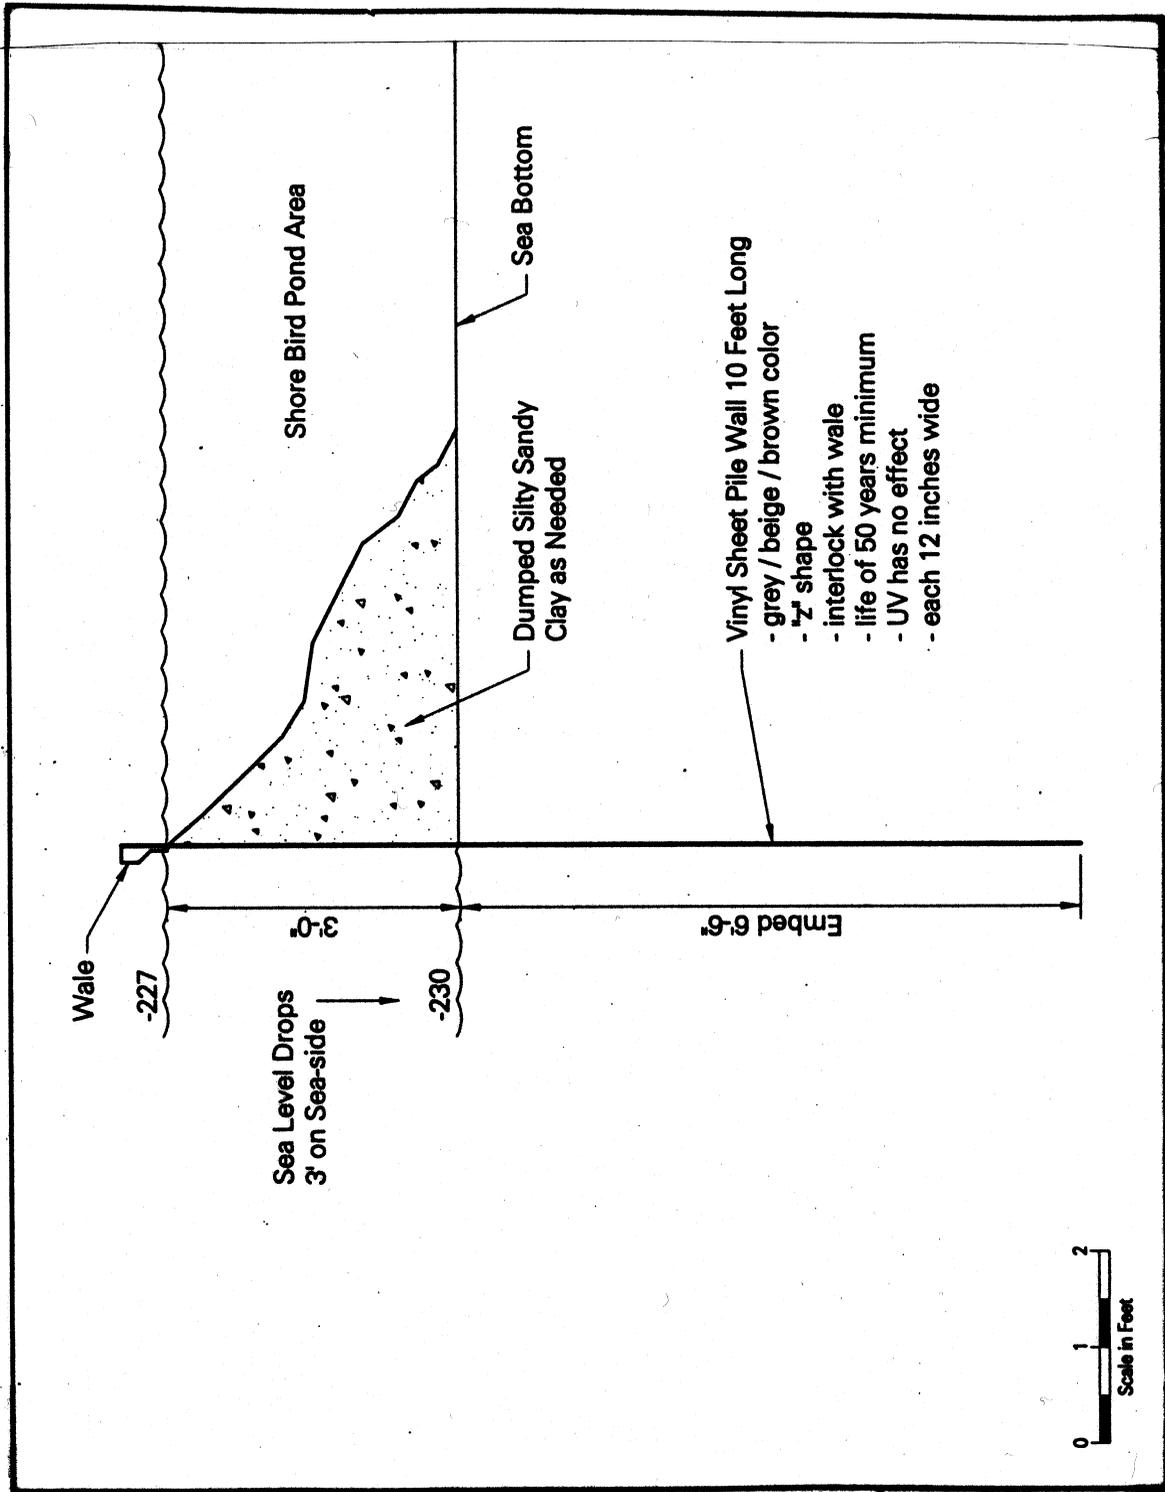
Typical vinyl sheet-piling dike cross-section for north wetland habitat and Pupfish Pond.
